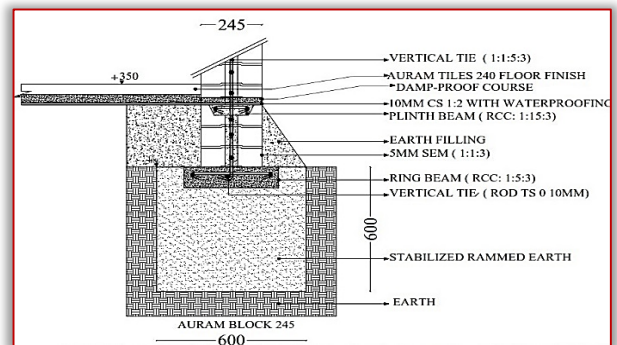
Compressed stabilized earth foundation and composite plinth beam
